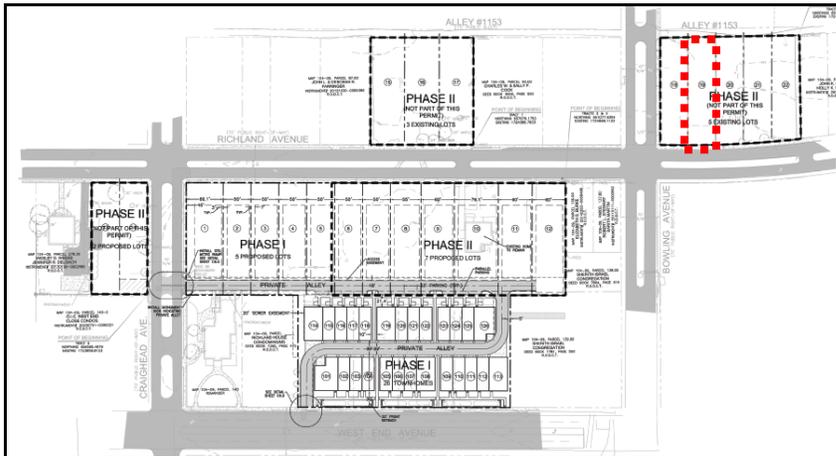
Overall site plan for the 22 infill houses planned for the Richland-West End Neighborhood Conservation Zoning Overlay. The red box indicates the site currently under consideration.
